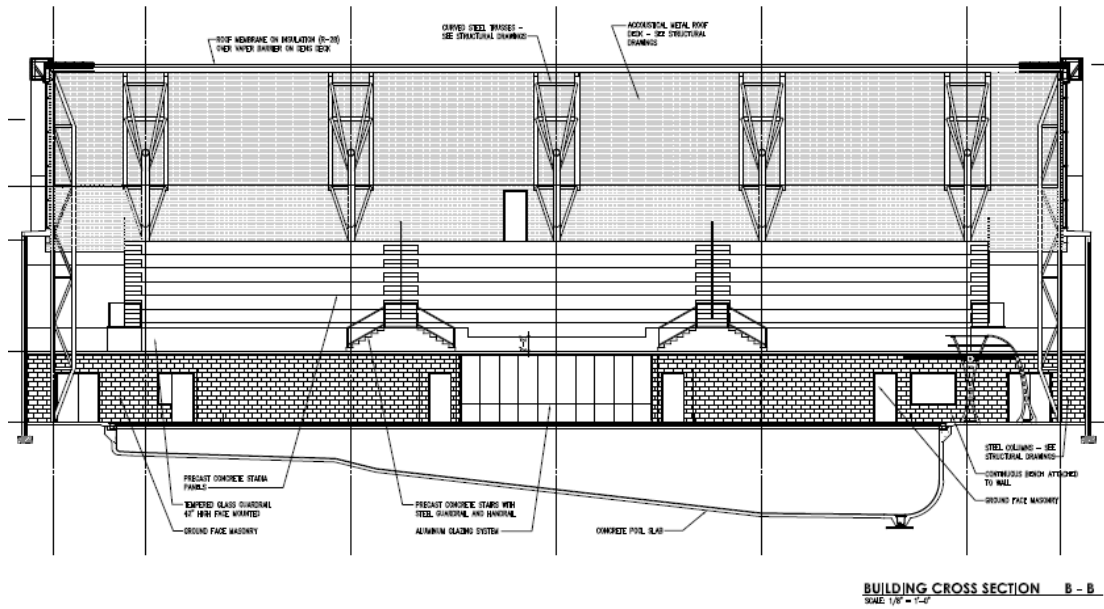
Cross Section Through Indoor Pool Area Showing the Wind Columns
